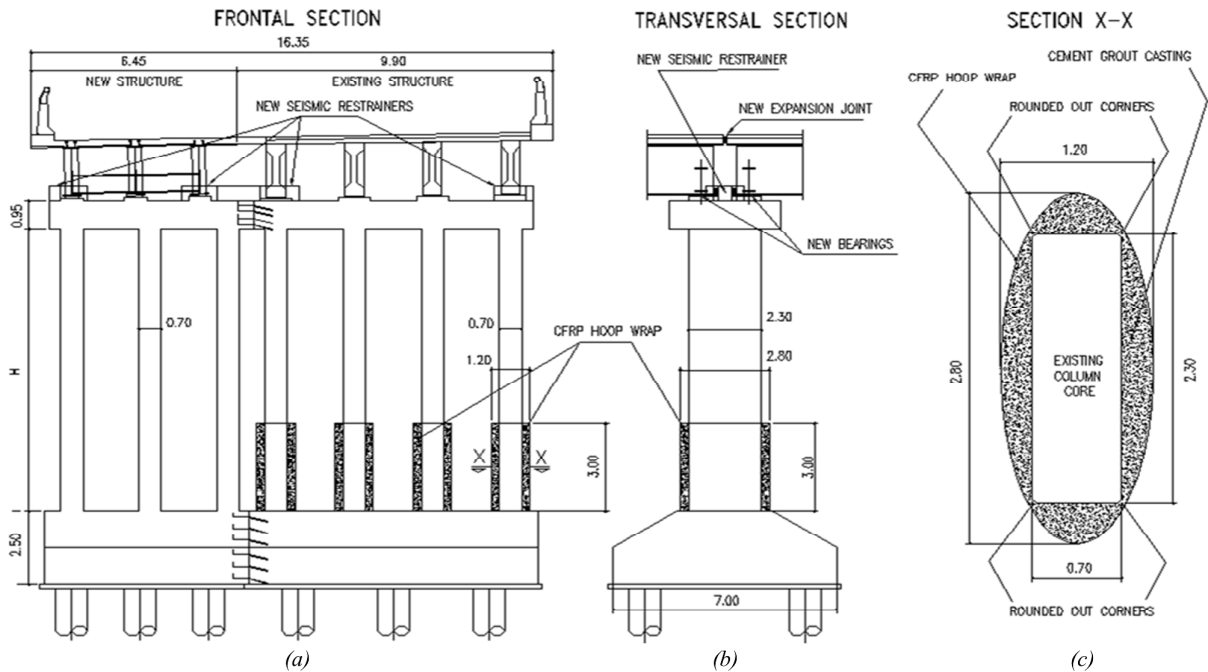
Seismic retrofitting intervention of Morignano Viaduct: (a) Replacement of existing bearings and expansion joints; (b) CFRP wrapping of the bottom part of the existing columns; (c) Modification of the cross-section shape to improve wrapping effectiveness.
